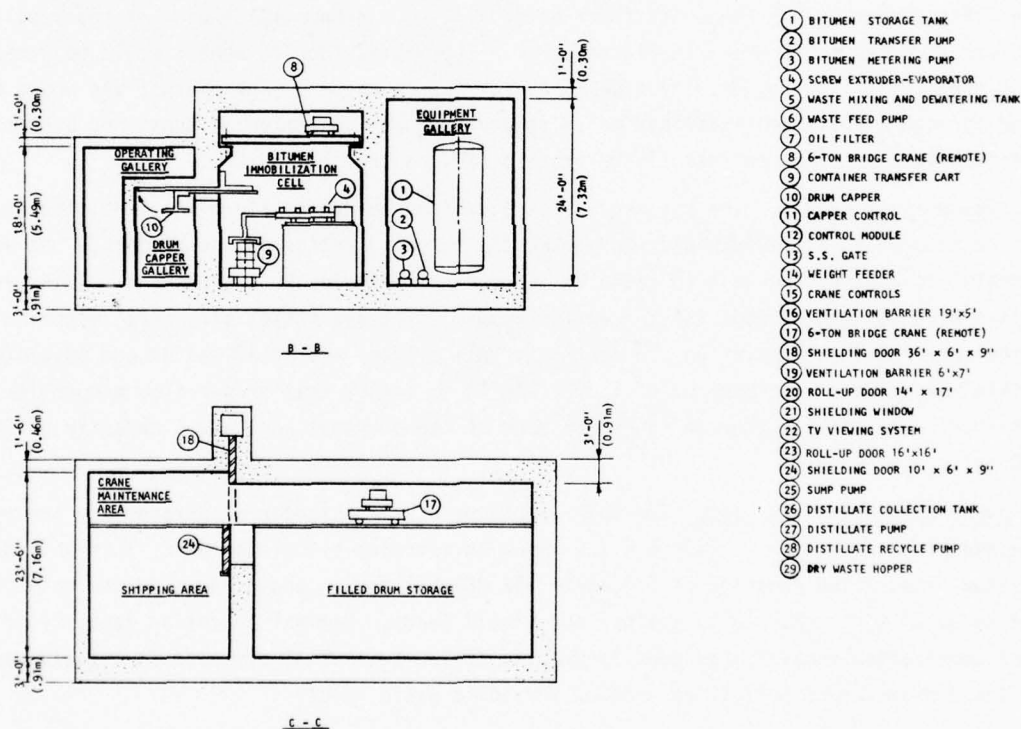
Fuel Reprocessing Plant Bitumen Immobilization Facility Plan, Sections B-B and C-C
